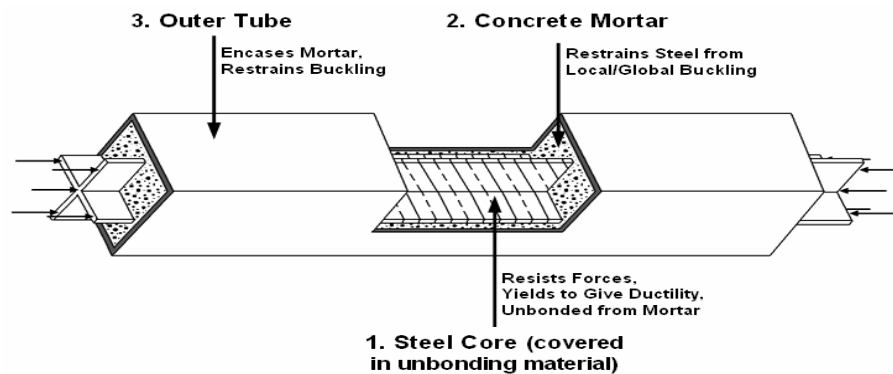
Buckling-restrained brace cross section view (Prinz, 2007).
